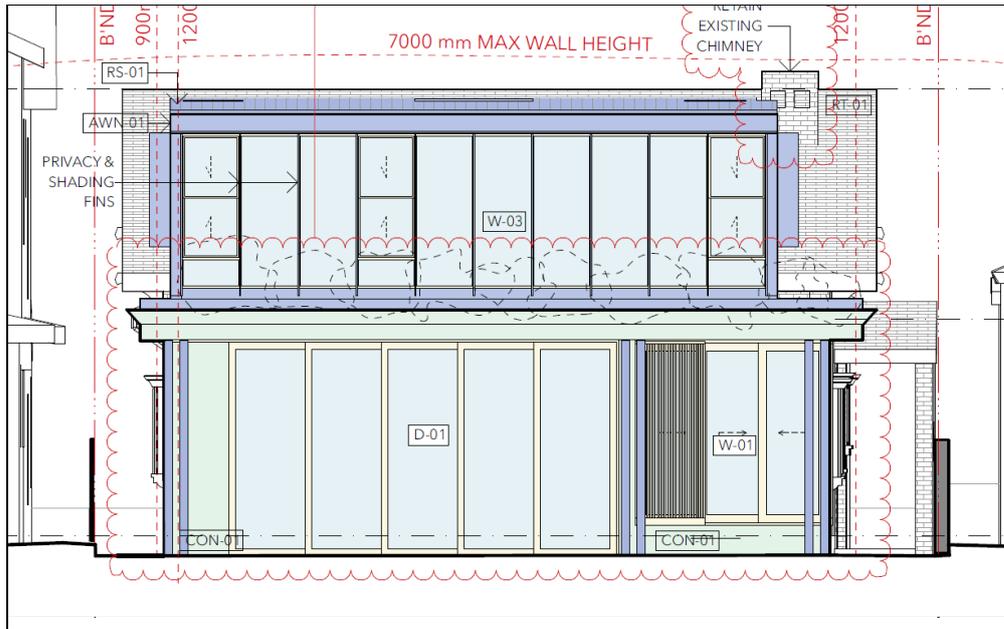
Approved Southeast Elevation (rear of the main dwelling)
